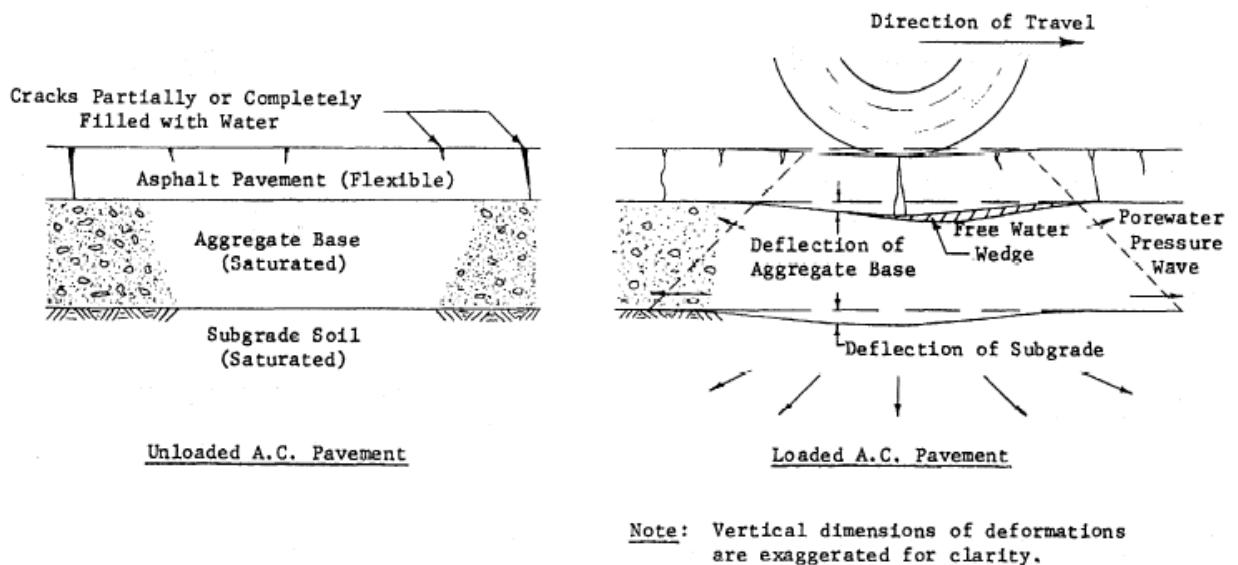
Adverse effects of water on asphalt concrete (AC) pavement (from Taylor and Khosla 1984)
